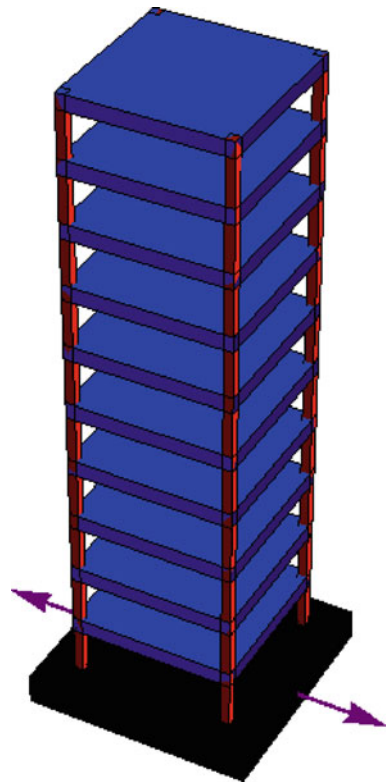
A model of a ten-story building undergoing seismic shaking
